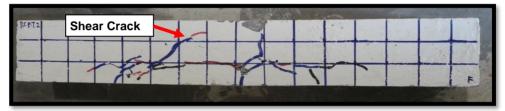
shows that scabbing and spalling did not occur when RCAI was subjected to 2.5 m/s impact loading. It indicates that the MAPEA block increase the plastic stress of beams and had overcome the transverse stress wave due to 2.5 m/s impact loading. However, the plastic stress that generated by MAPEA was not enough to withstand the longitudinal (Lu, 2003) and transverse stress wave that produced by 5.5 m/s impact loading. Hence, the spalling and scabbing was observed in MAPEA block (Figure 5b).
